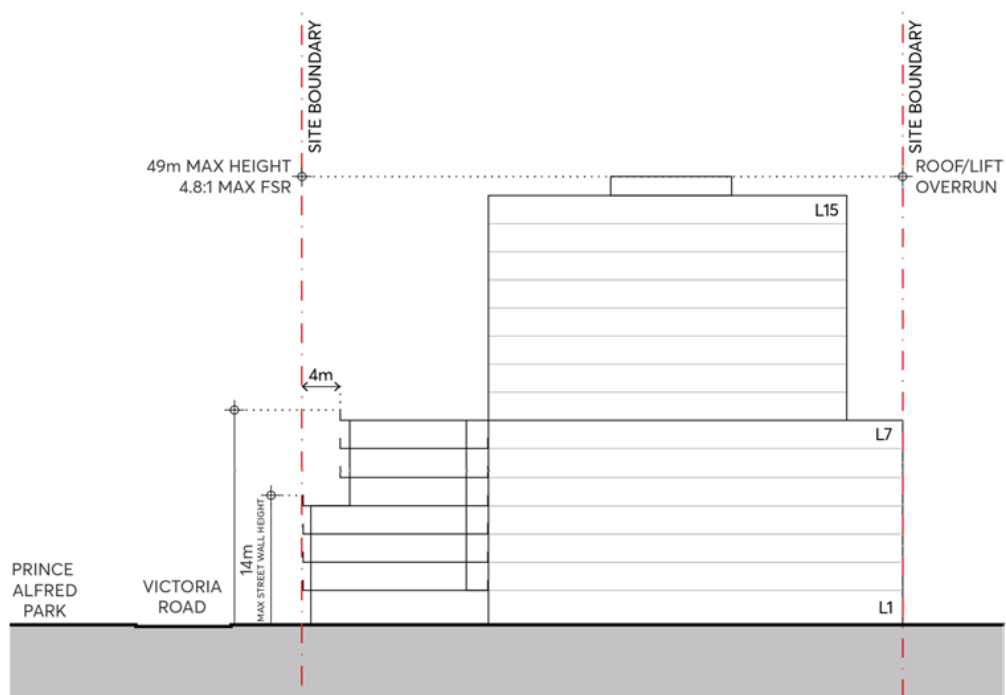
North - South Section of Site Building Envelope
